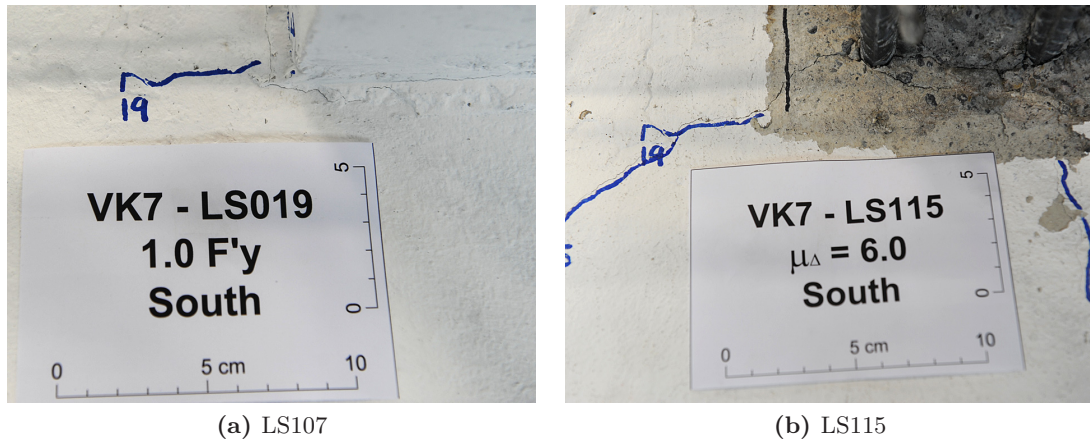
Crack in the foundation at the North-West edge of the pier at LS019, when it was first visible (a) and after the concrete cover had spalled off (b).
